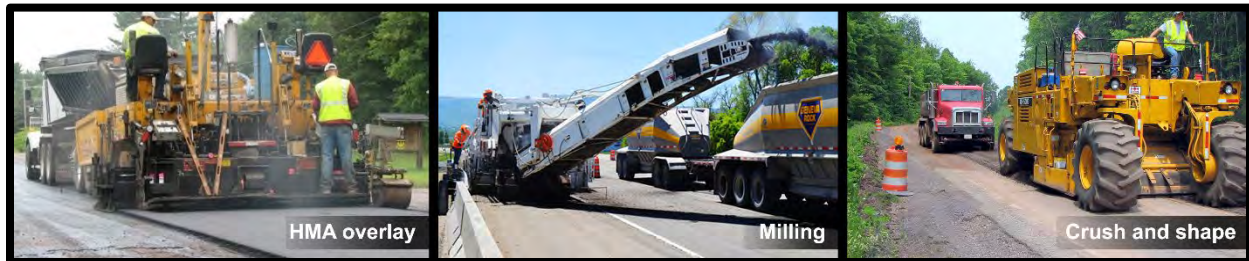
Examples of structural improvement treatments(from left) HMA overlay on an unmilled pavement, milling asphalt pavement, and pulverization of a road during a crush-and-shape project.
